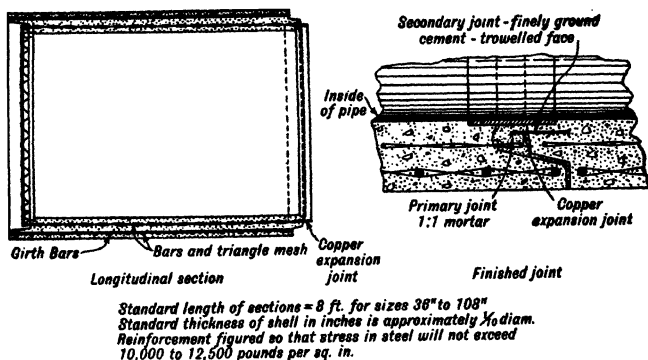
A Type of Joint Used on Pre-cast Reinforced Concrete Pipe. For Low Heads and Heads up to about 130 Feet.
